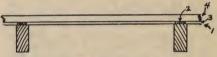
Insulation with non-tearable paper (new building) (rat proof).
